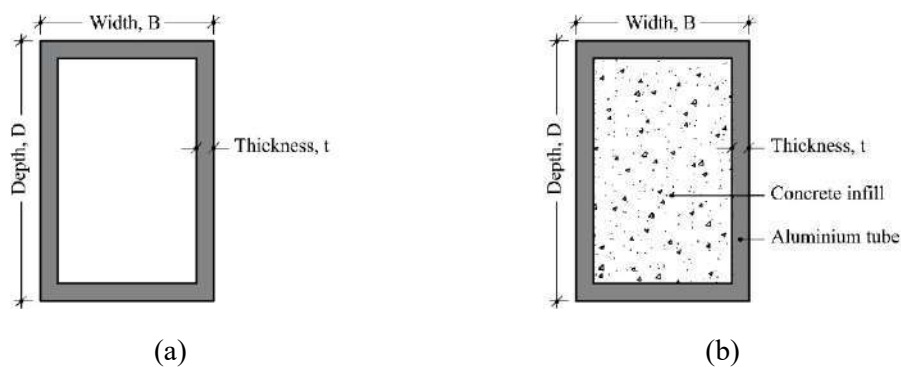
Cross-sections of a typical (a) BAT beam, (b) CFAT beam.
